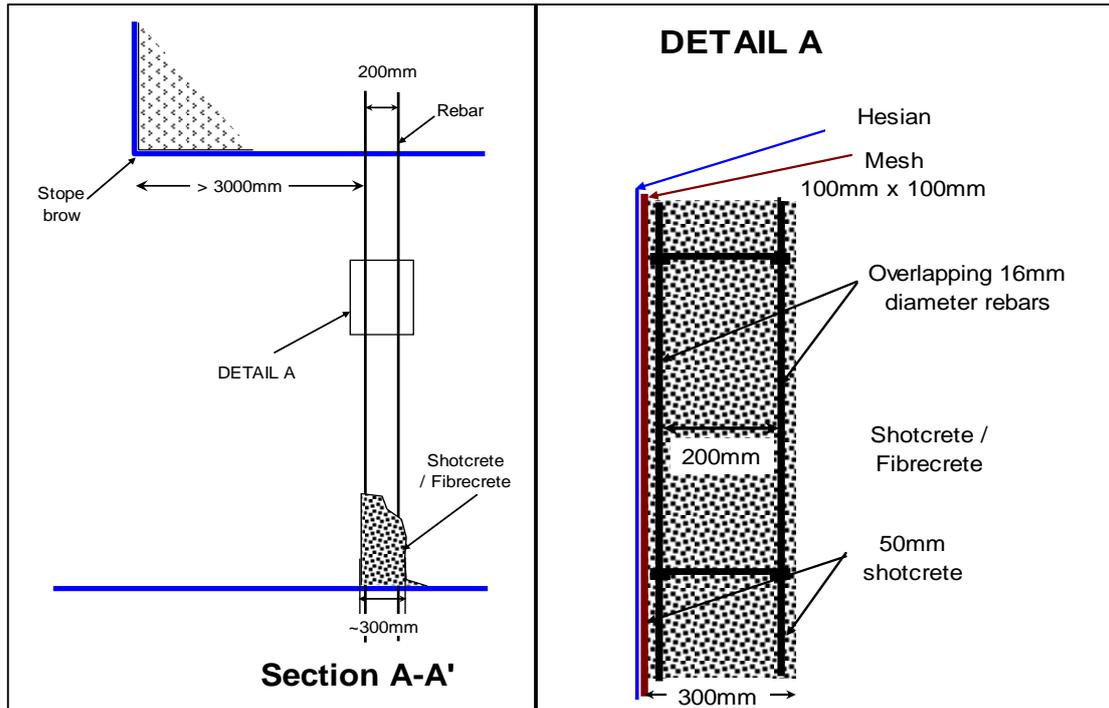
BACKFILL BULKHEAD WALL DESIGN
